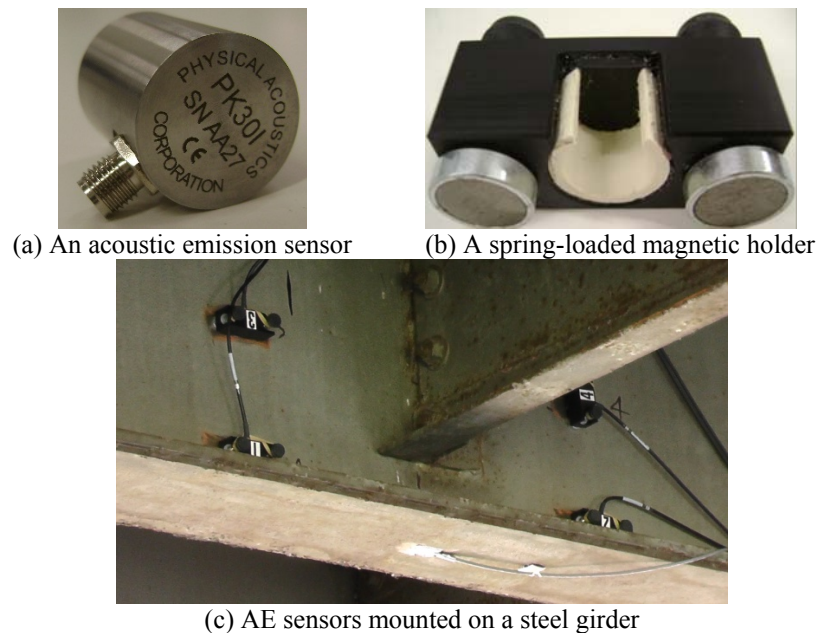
(a) An acoustic emission sensor, (b) a spring –loaded magnetic holder, and (c) AE sensors mounted on a steel girder
